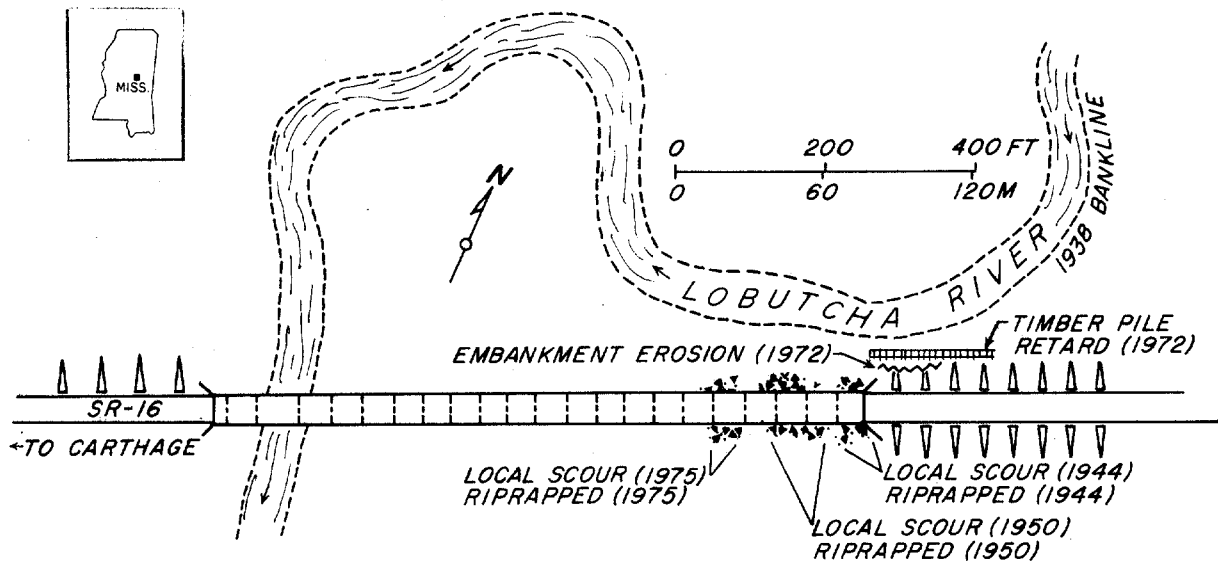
Plan sketch of Lobutchka Creek at SR-16.
